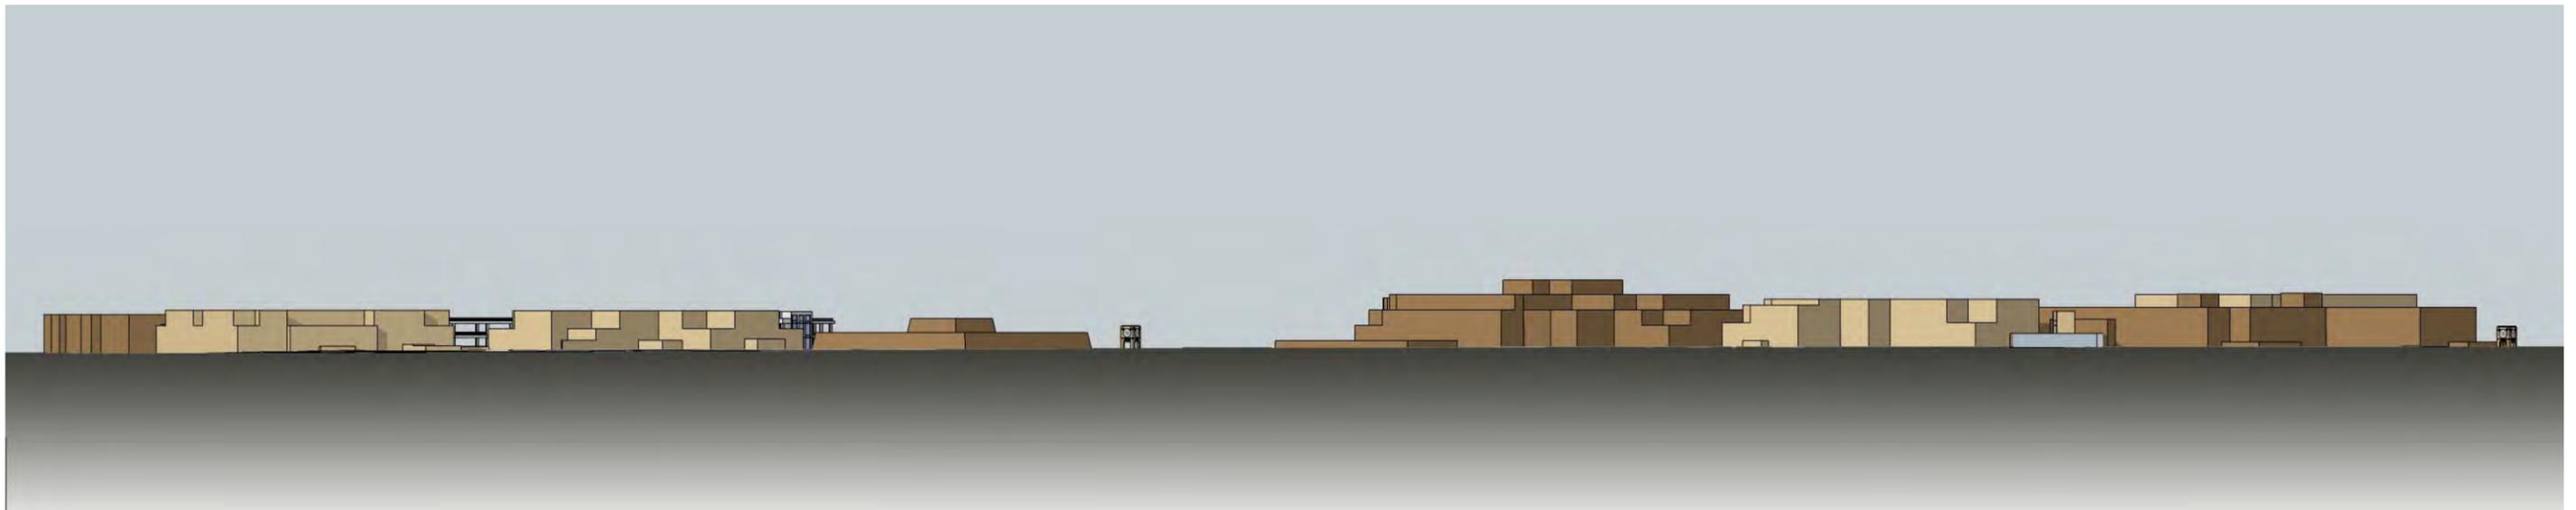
Section from St. Francis Looking West - Example of Building Height from St. Francis
